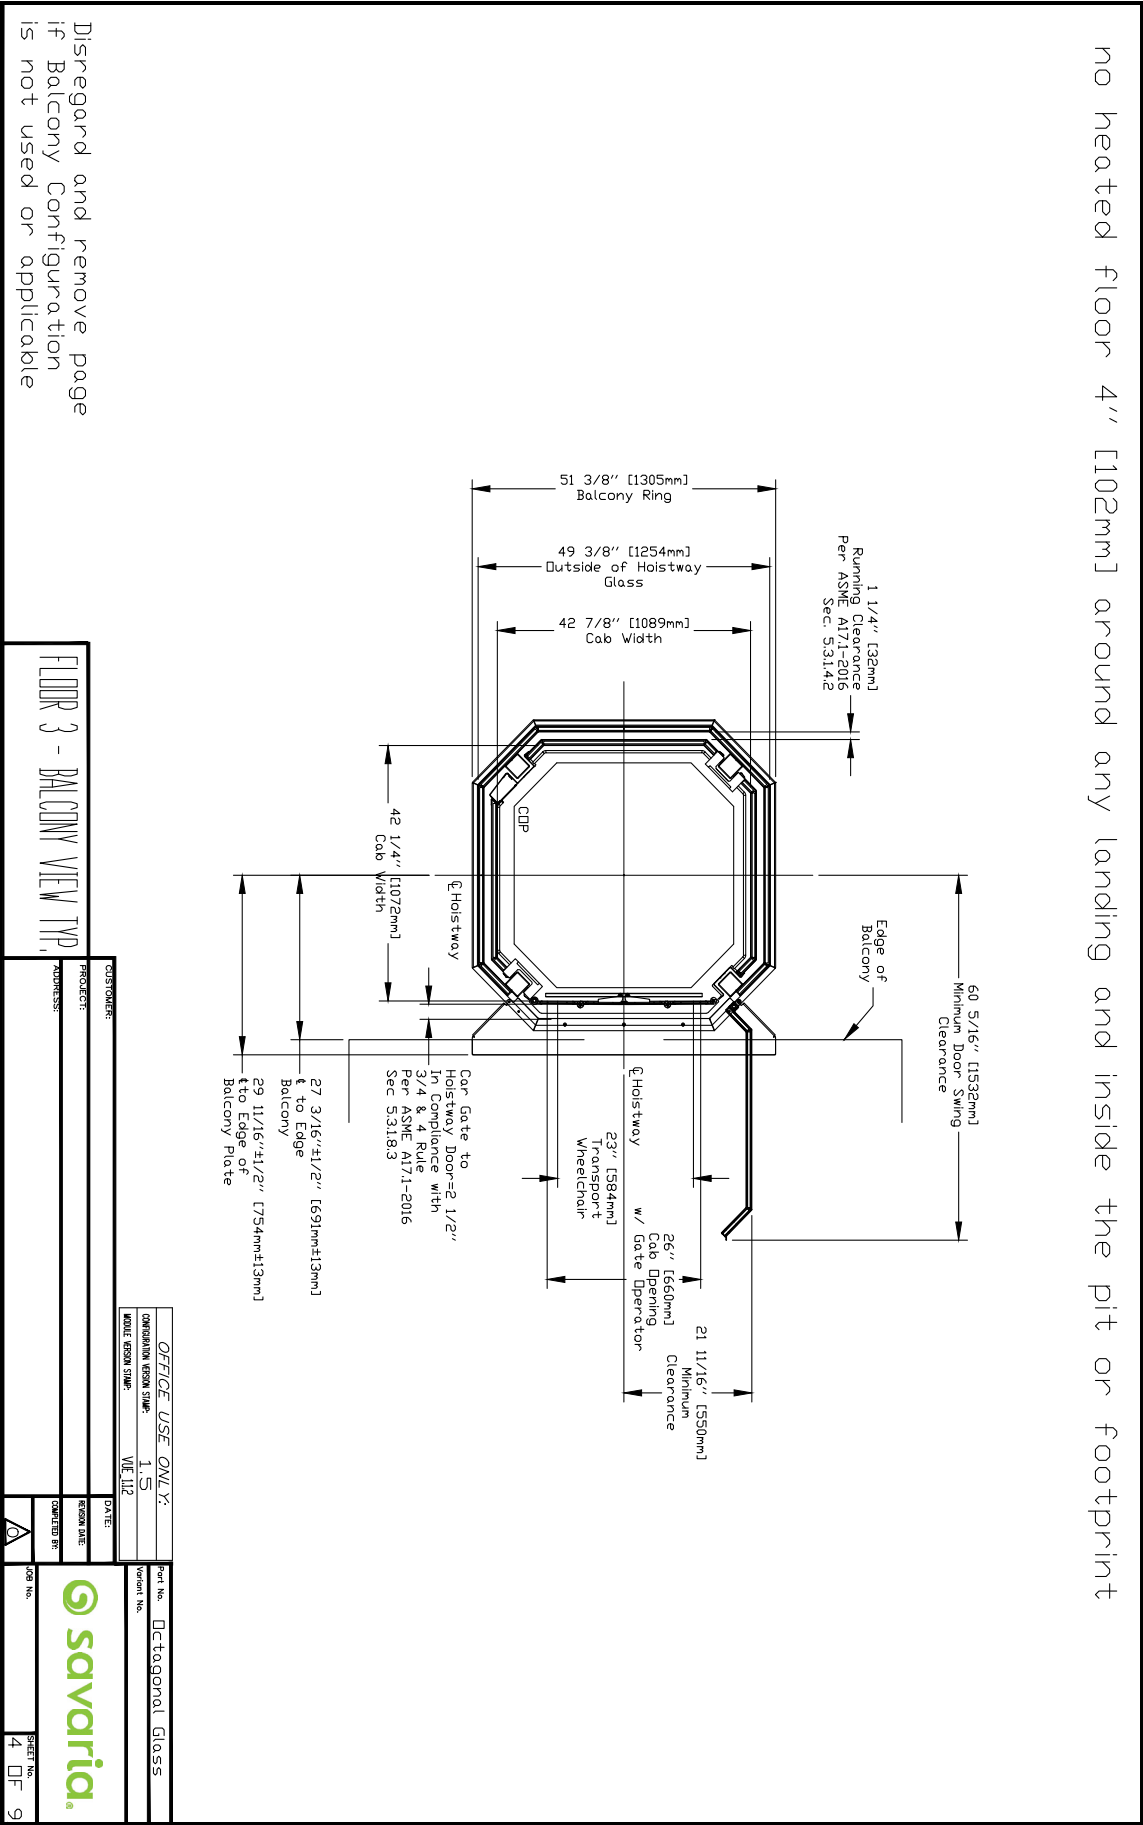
Balcony plate and handrail information - octagonal glass (OGM) type 1 shown
